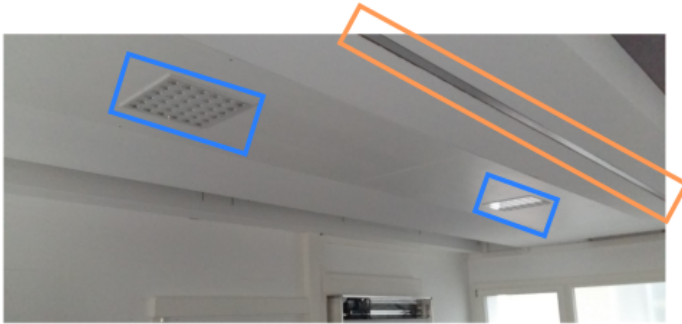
Smart luminaires (blue) and “standard” LEDs (orange) fittings on the ceiling of the LIER lab/meeting room.
